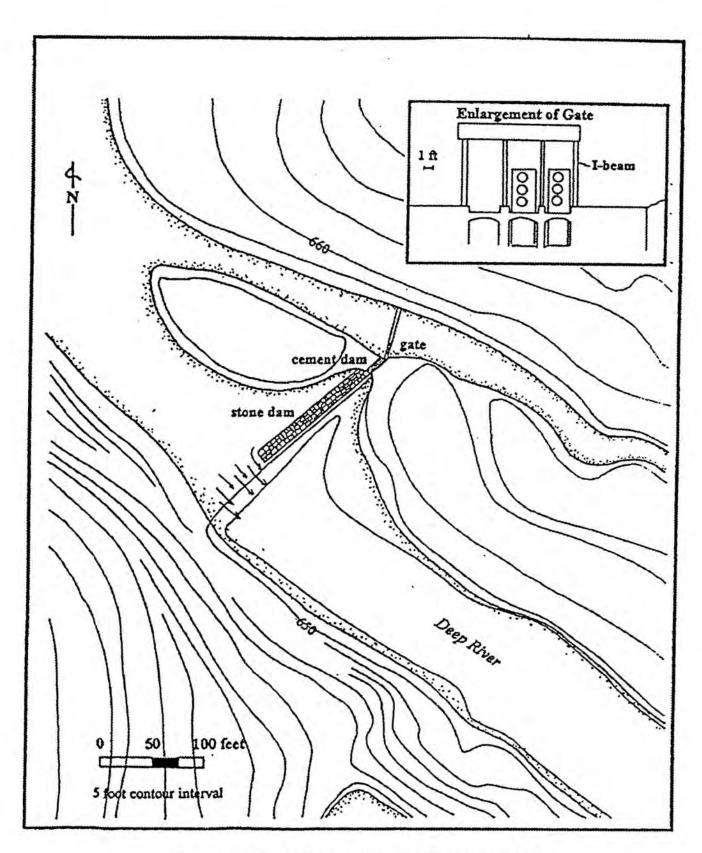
Site Plan of Coletrane Dam and Flood Gate (R 07)
